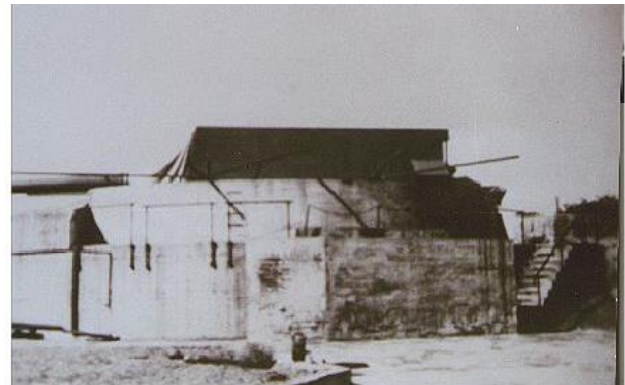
9.2 inch gun emplacement No. 1, being prepared for gun installation.
